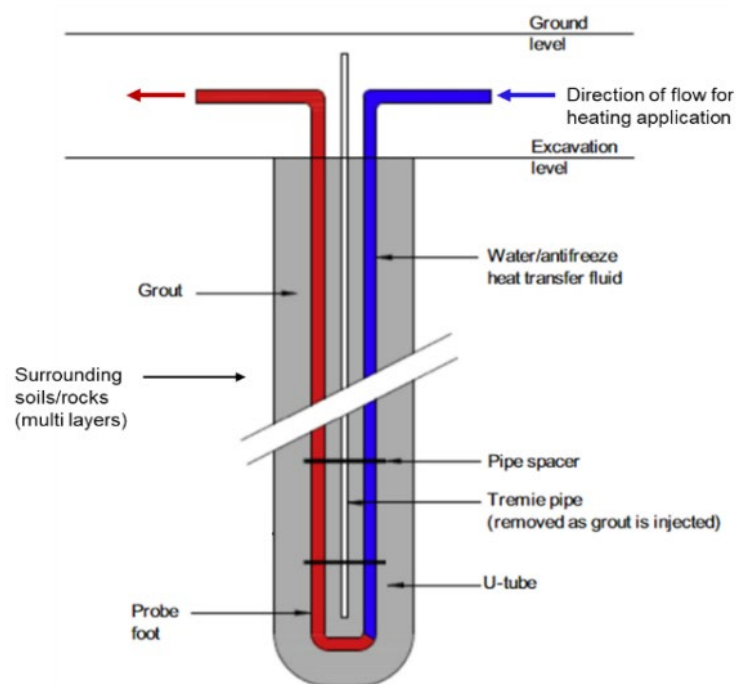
Grouted borehole construction. Source: Wu et al., 2023
